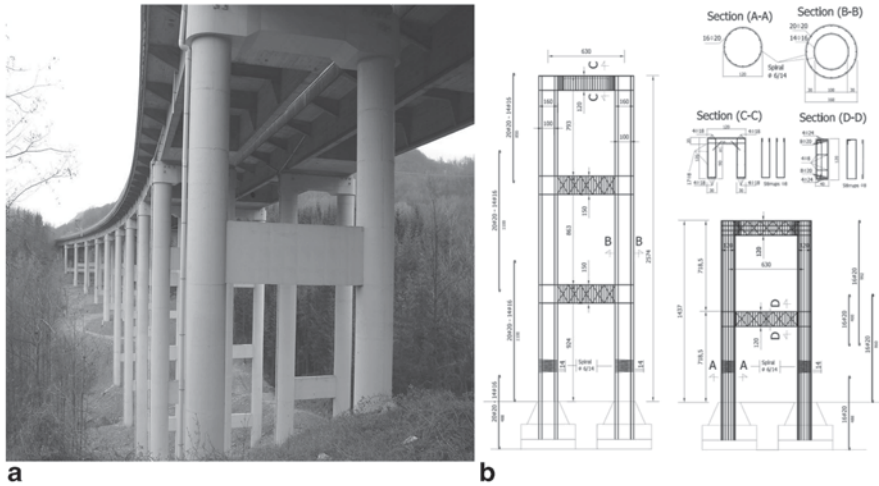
a General view of the bridge, b Section and reinforcement details of piers 9 (*tall*) and 11 (*short*)
